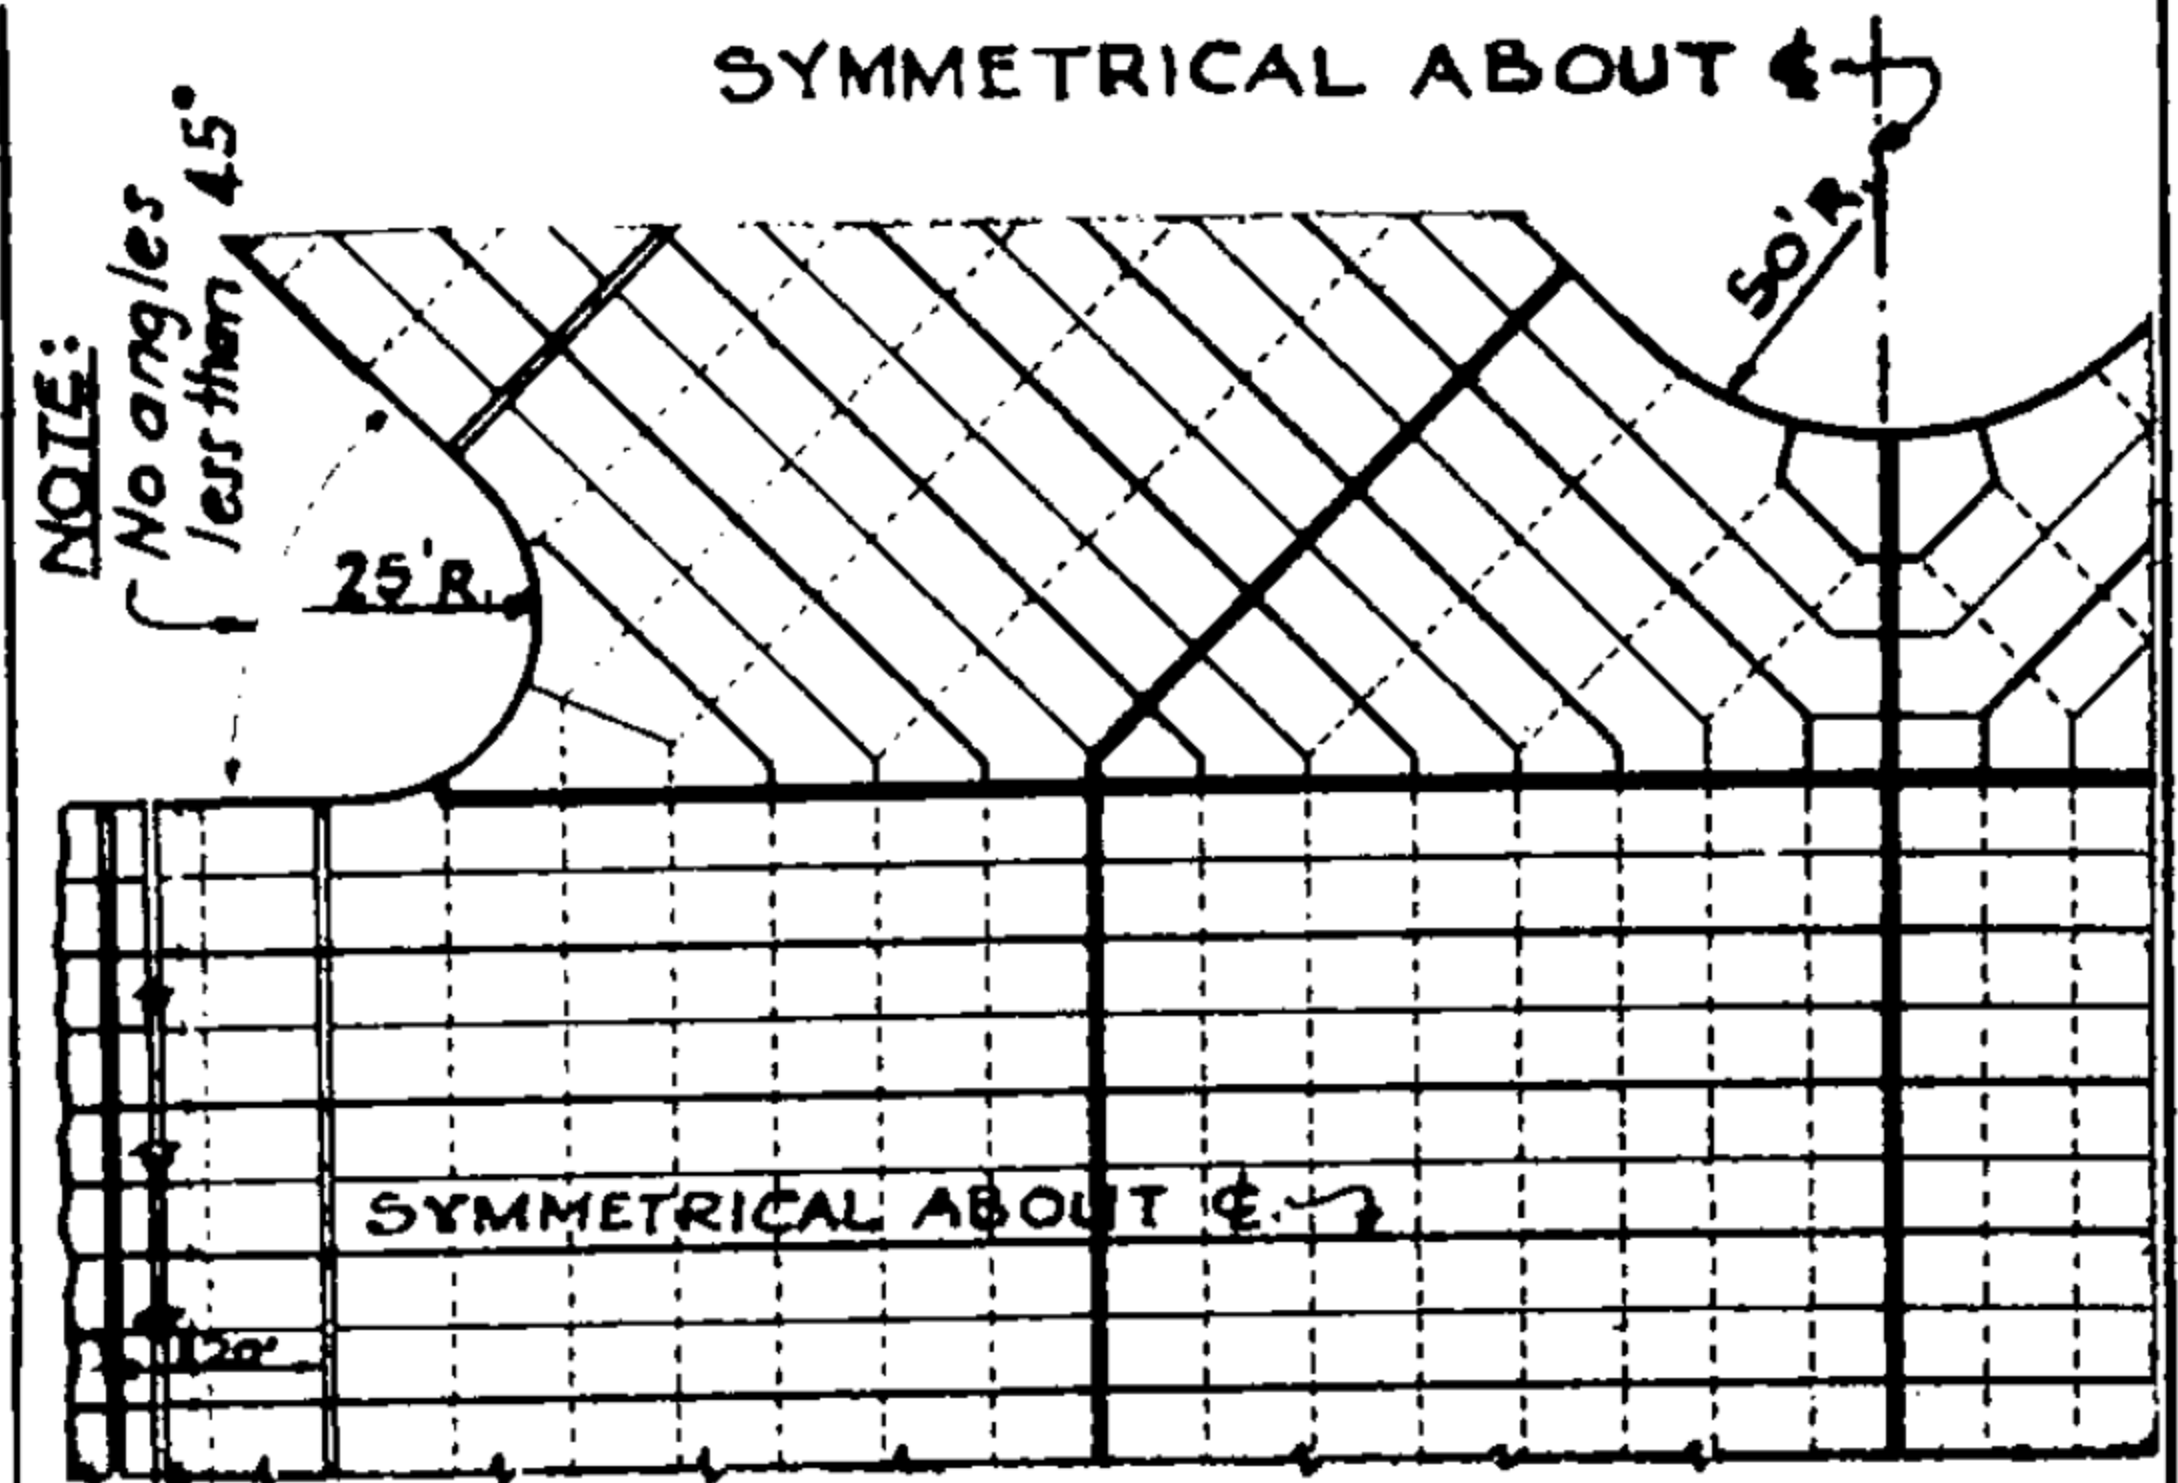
/4 JOINTING PLAN 3 RUNWAYS.
